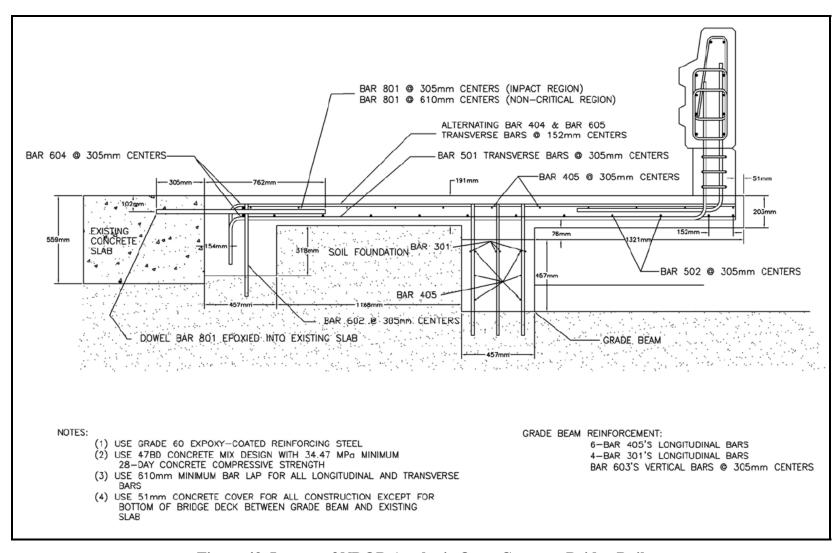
Layout of NDOR Aesthetic Open Concrete Bridge Rail
